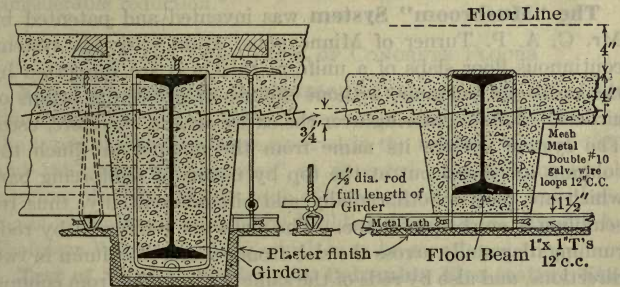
Furred Ceiling Construction, U. S. P. O. Bldg., Spokane, Wash.
